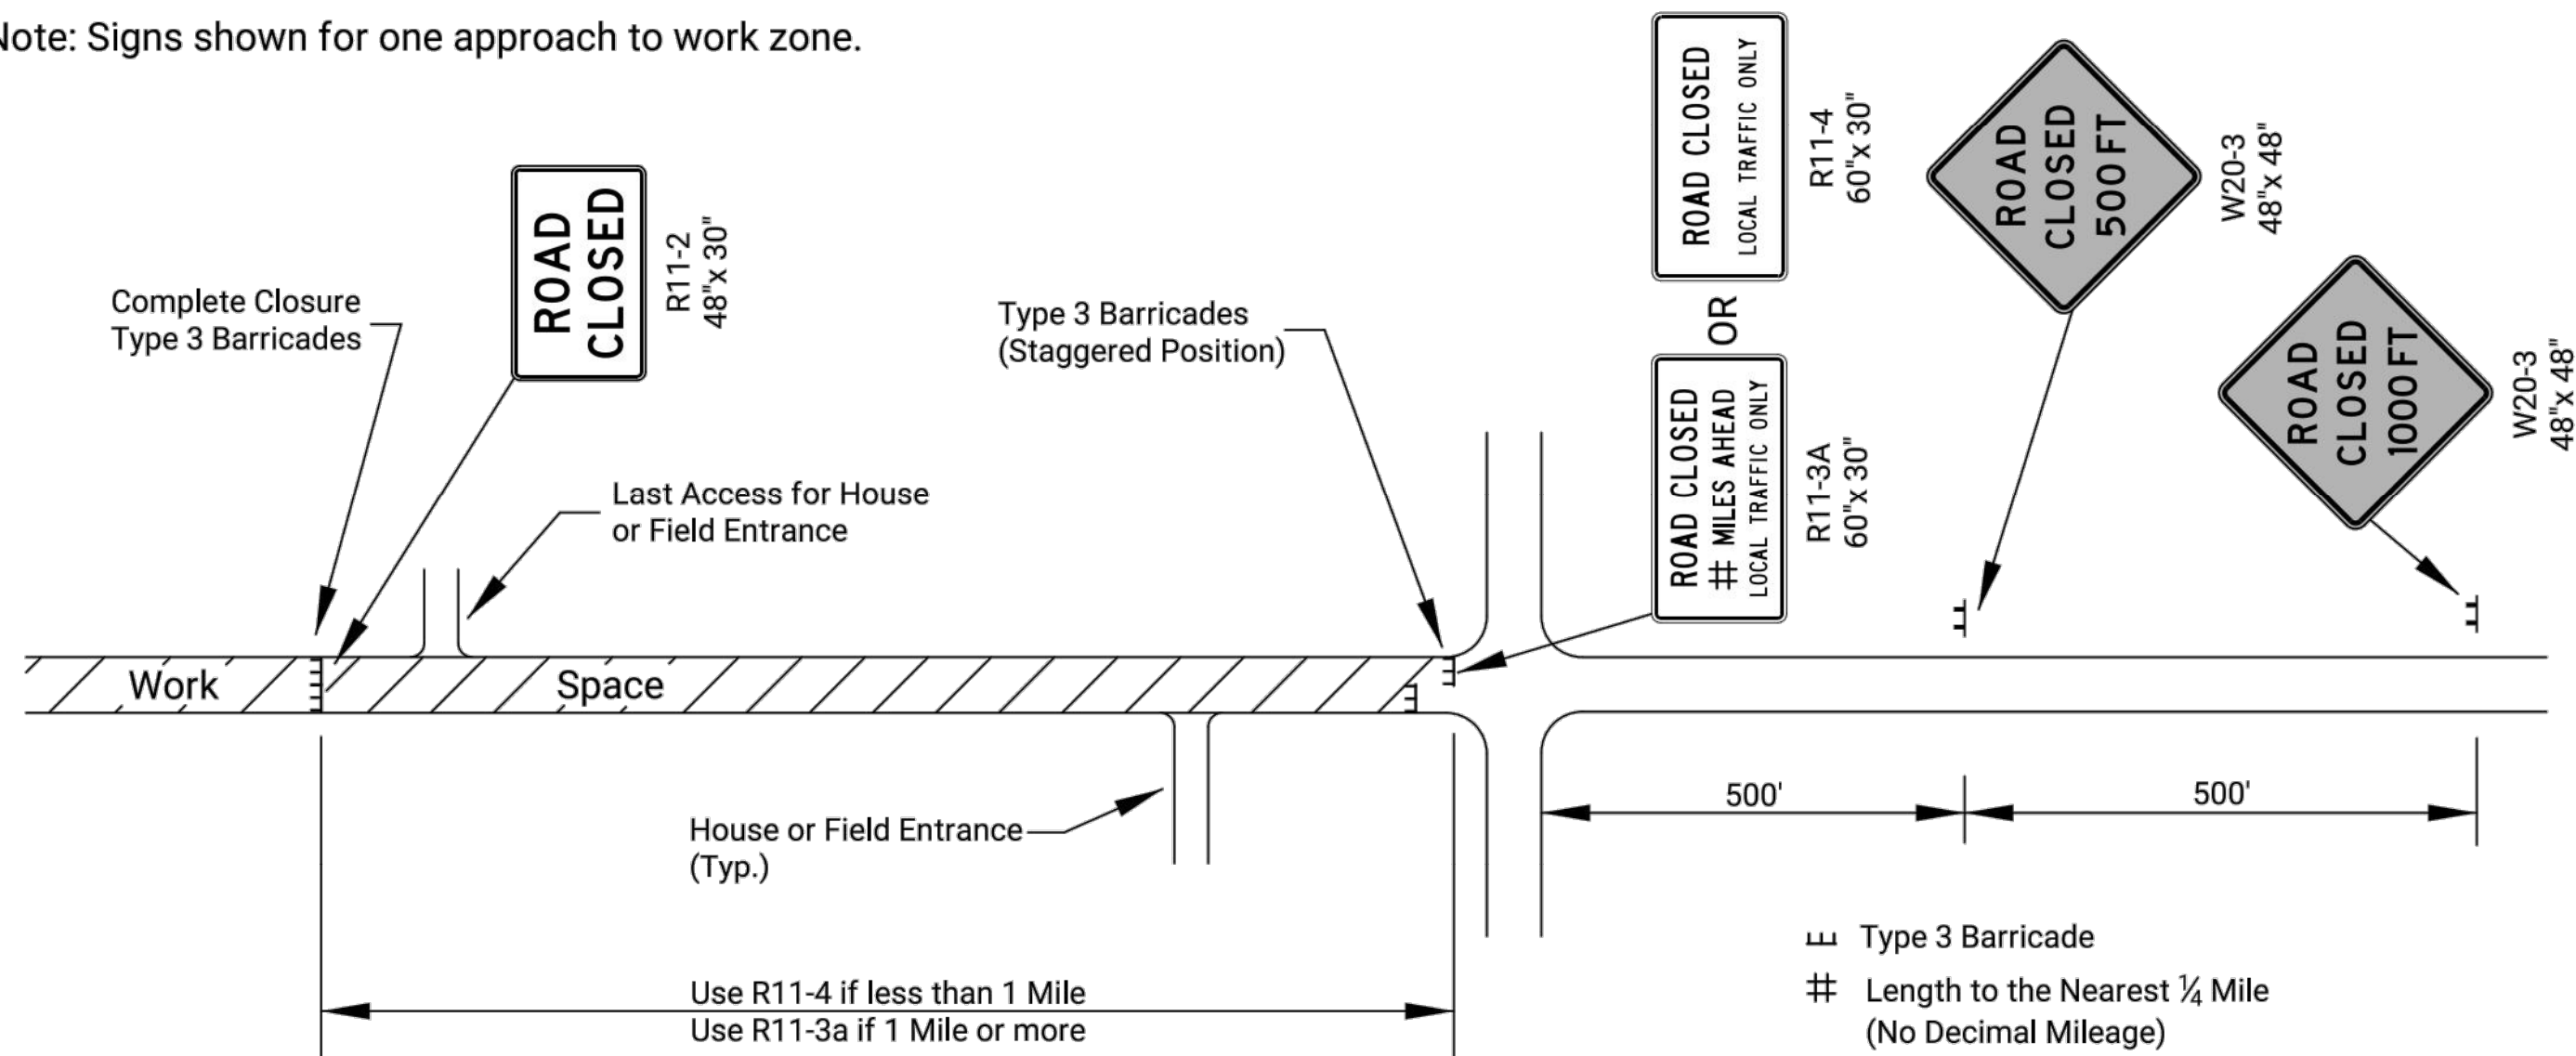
TYPICAL SIGNING FOR ROAD CLOSURE - LOCAL TRAFFIC ACCESS
